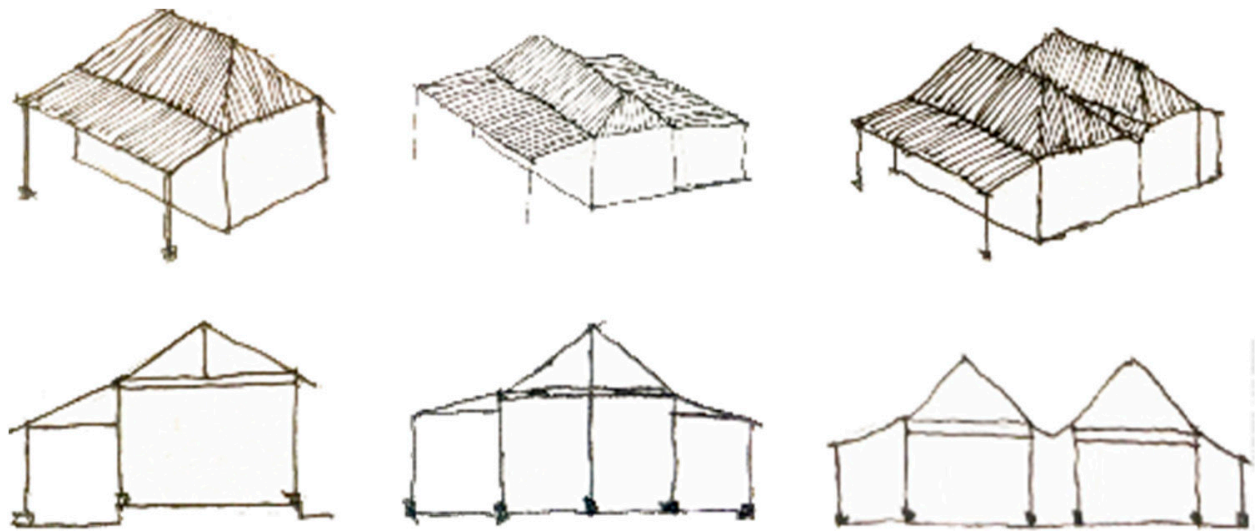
Redrawings of traditional houses in Bintoro. Source: [36] (p. 95).
